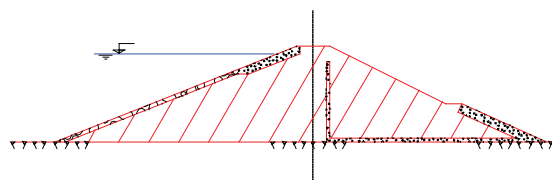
Typical cross-section of an earthfill dam.
